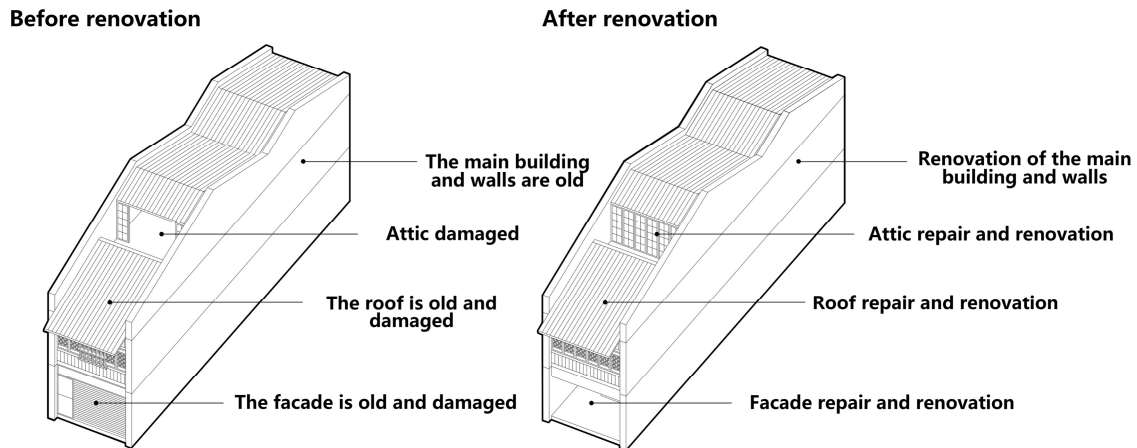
Protection and Renewal of Residential Building No. 55 Haopan Street
